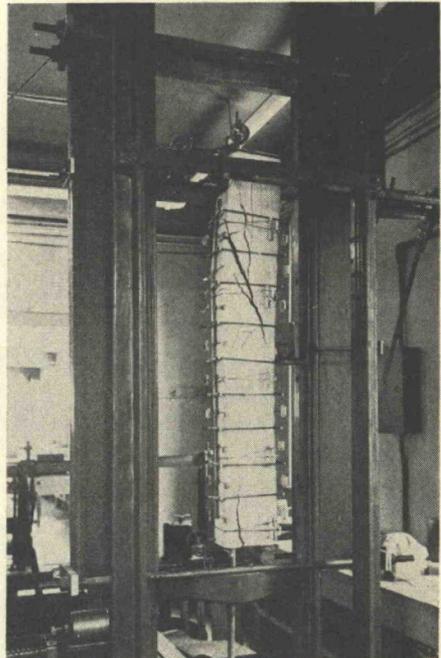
Beam No. 17 After Test. A Typical bond and/or diagonal tension failure. The Secondary Split at the Bottom Was the Result of Lateral Rebound from the Let-Go as Failure Occurred.
